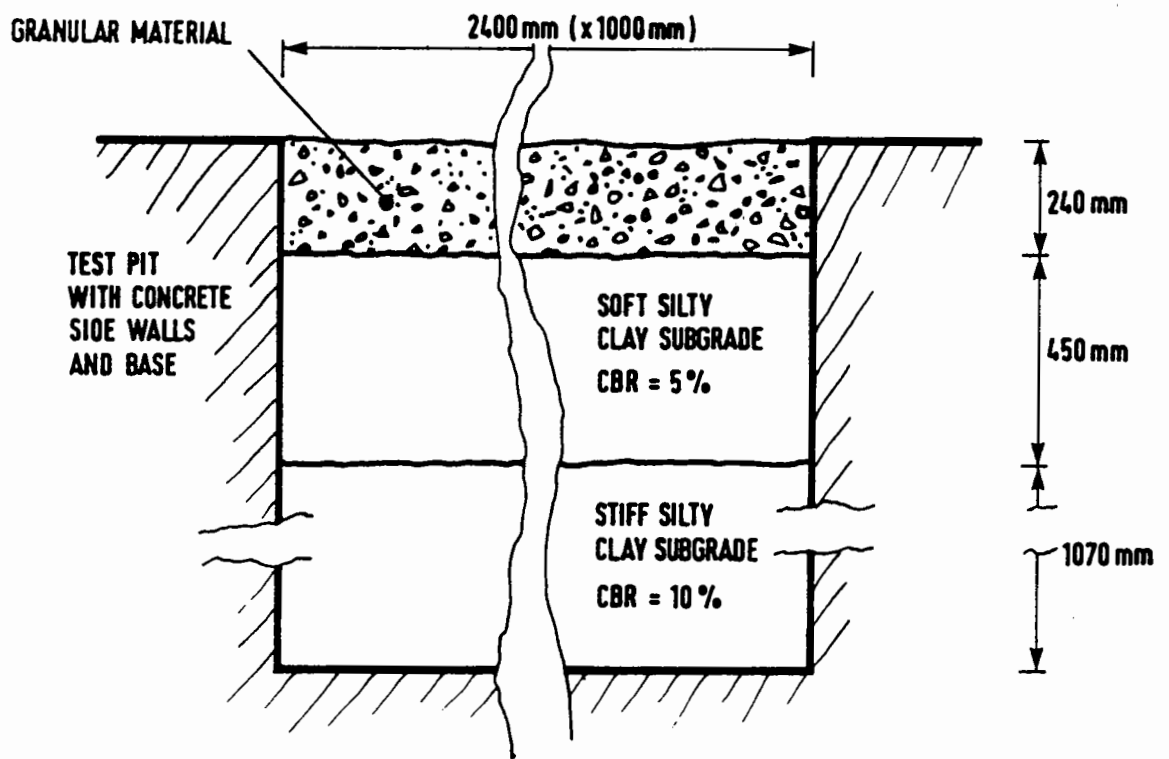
Cross-section of Pavement Structure used in Tests carried out in the Pavement Test Facility.
